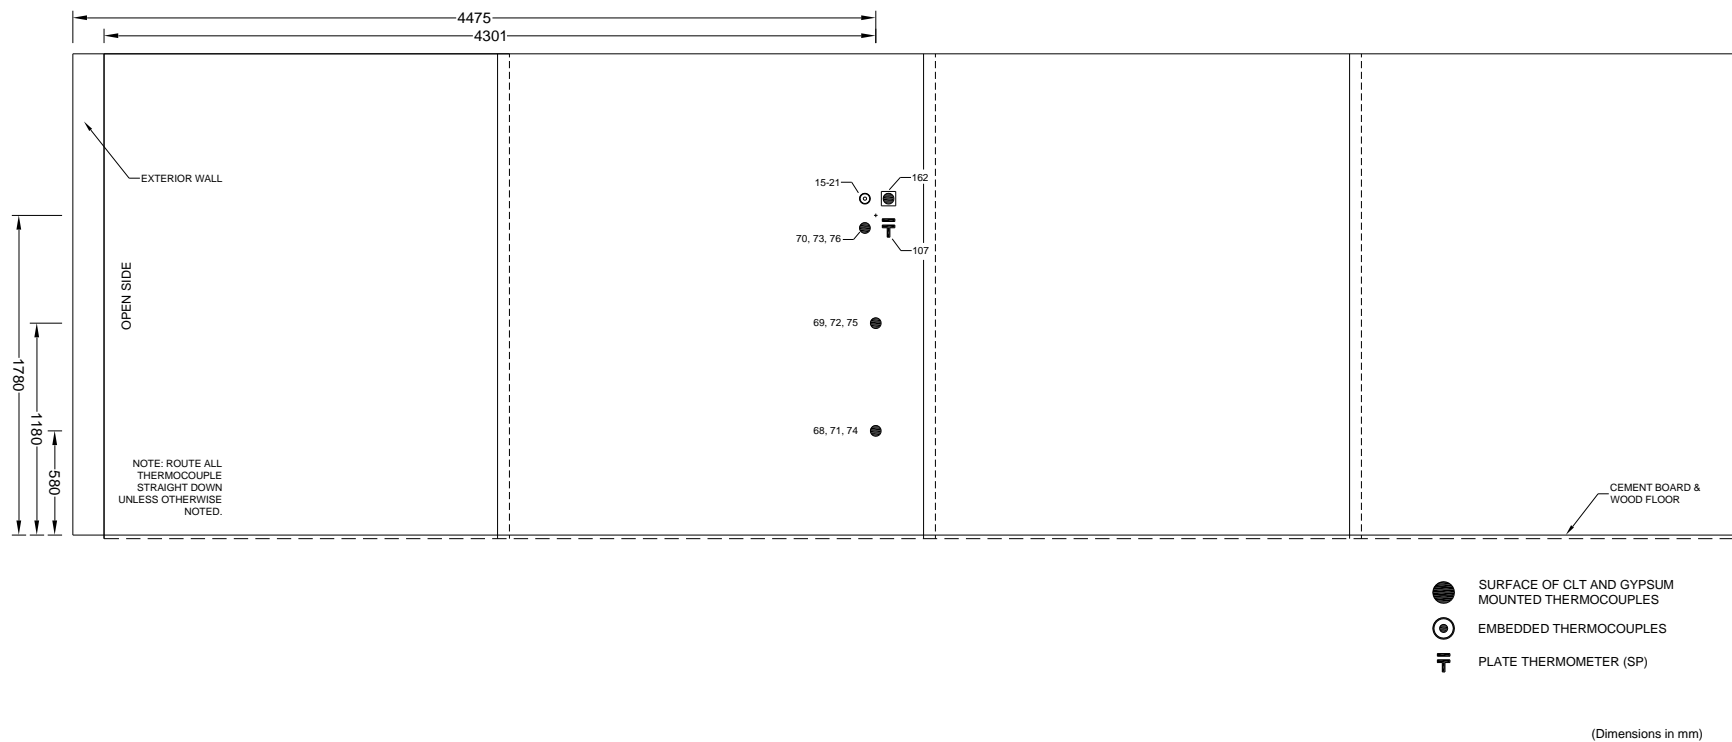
Test 1-5 Large Compartment CLT - W3 - Instrumentation Layout
